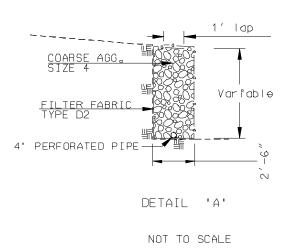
Detail for Fabric Reinforced Backfill under the Approach Slab
